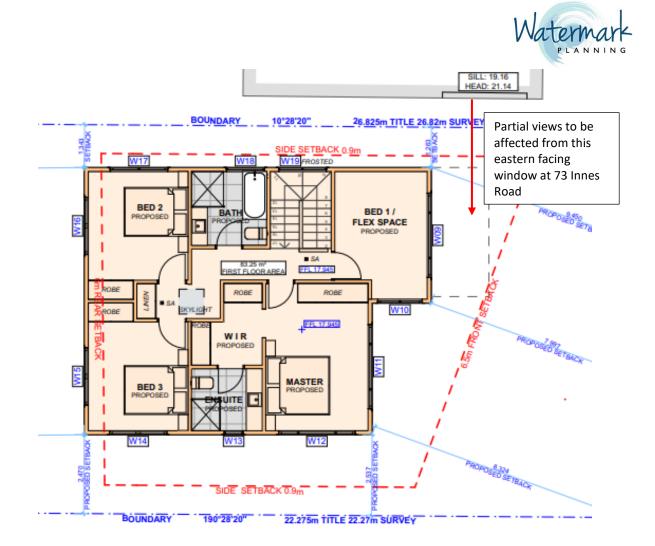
Excerpt from Architectural Drawing DA09 Proposed First Floor Plan and the location of the existing window at No.73 Innes Road (from where views are obtained subject to this assessment)
